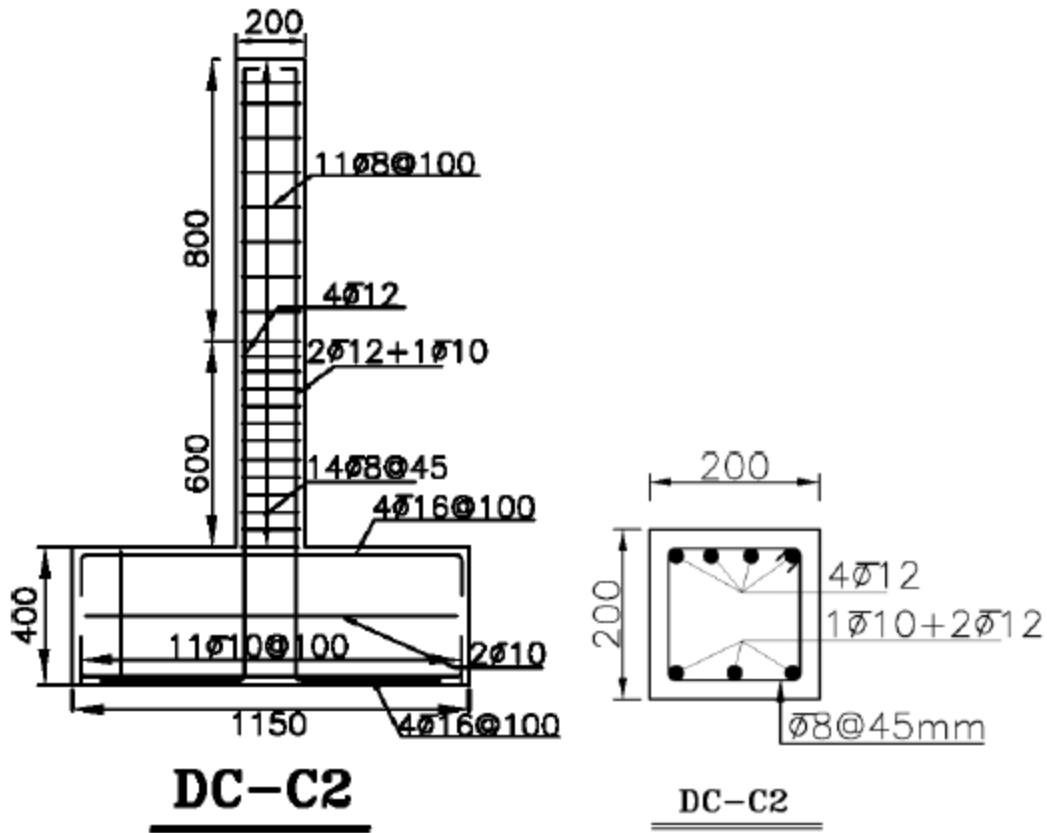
Reinforcement layout for specimen DC-C2 [Marefat et al.,2009]
